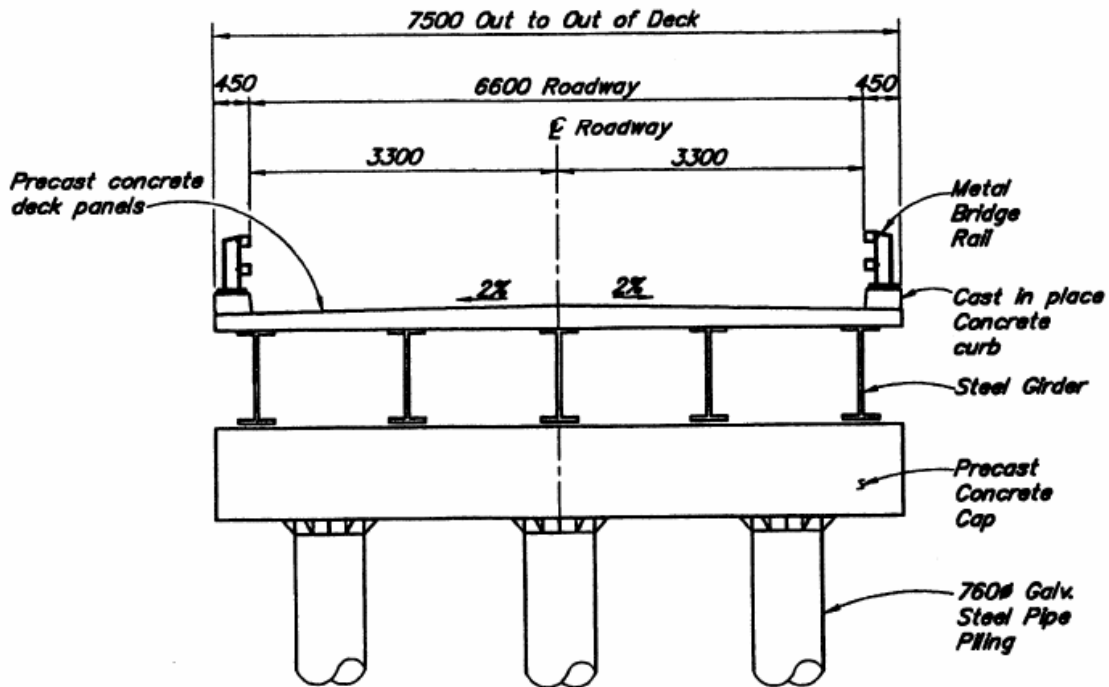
Cross section of the Kouwegok Slough Bridge
